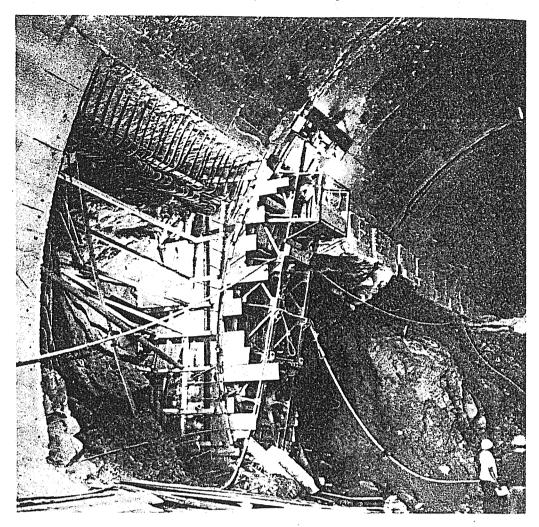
Pit excavation for wall construction, Imigrantes Highway [7]
